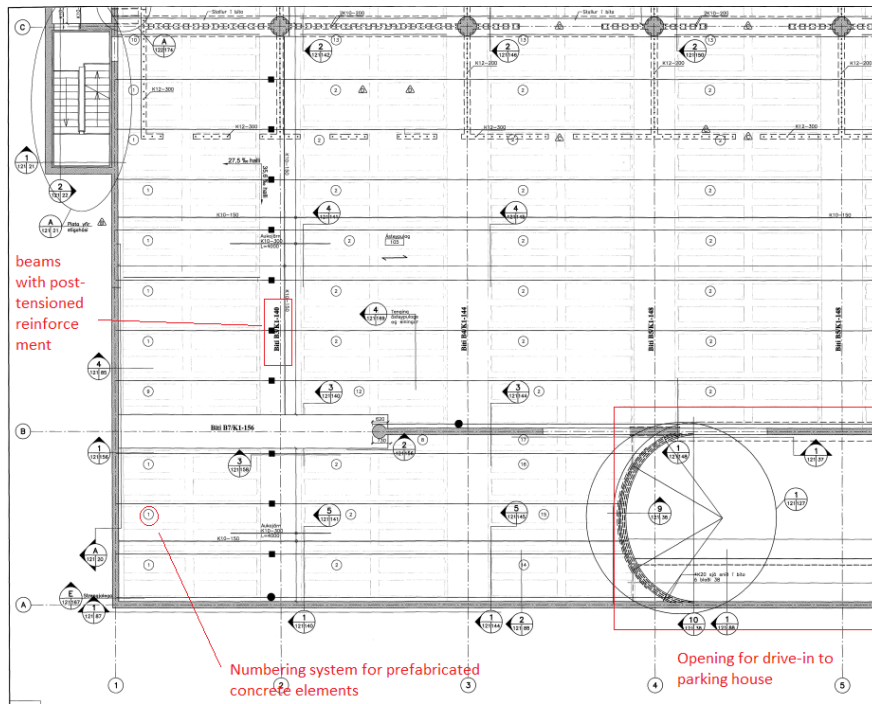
A segment of the original sketches provided by Verkis, illustrating the overall layout of one floor of the parking house
